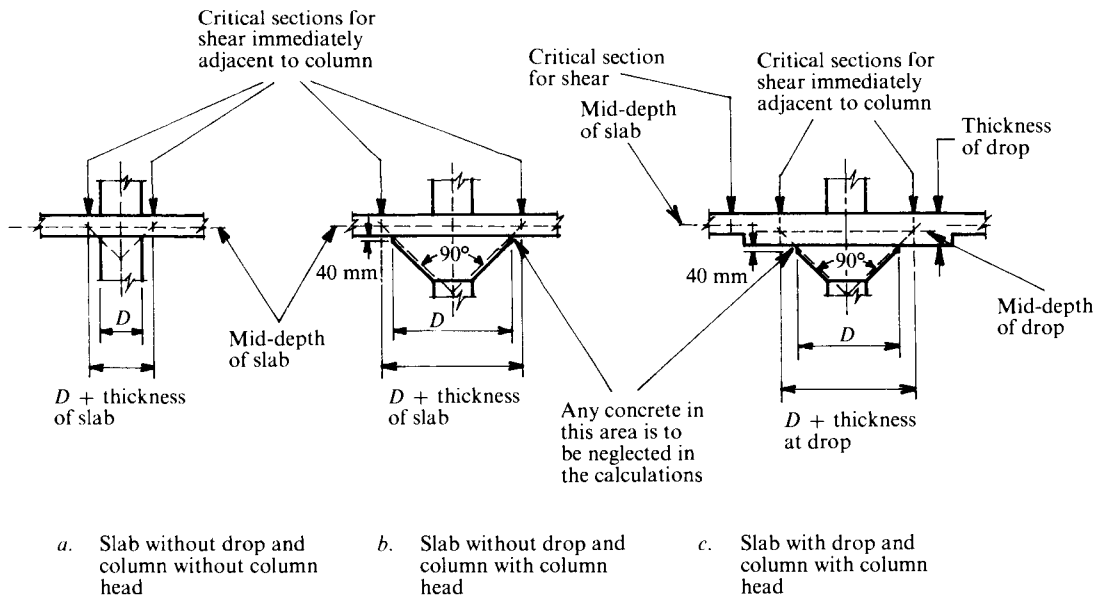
Critical sections for shearing stresses in flat slabs
